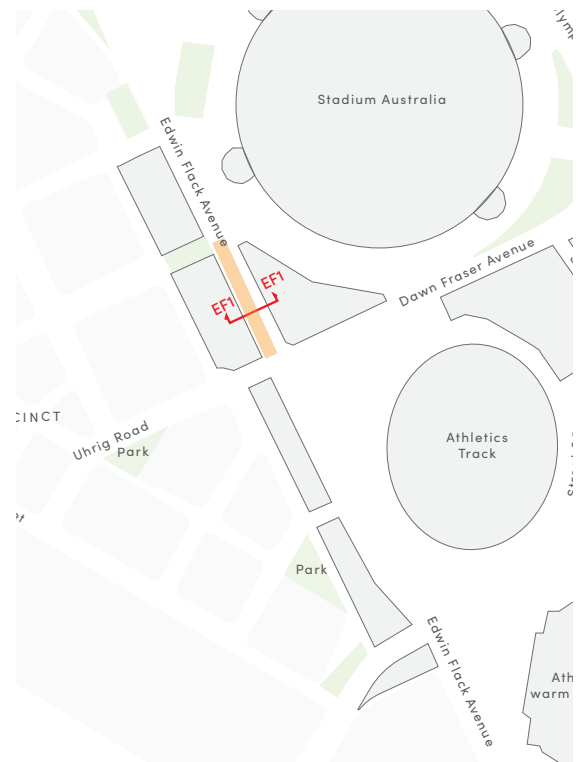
Edwin Flack Neighbourhood movement plan
